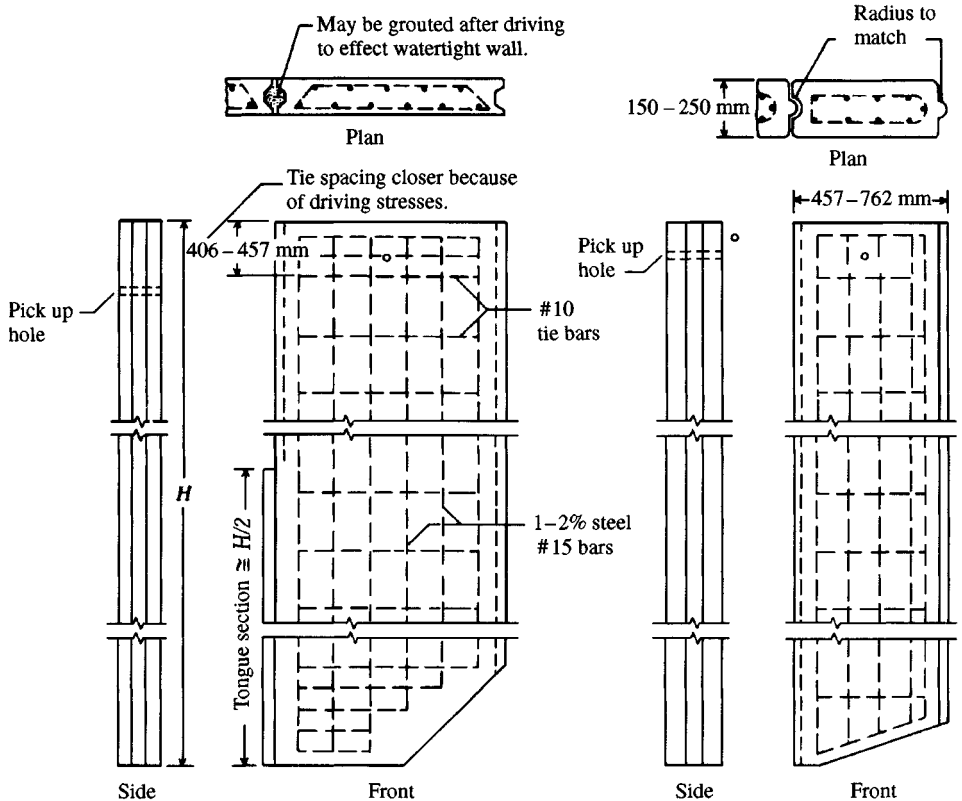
Typical details of reinforced concrete sheet piles. [After PCA (1951).]
